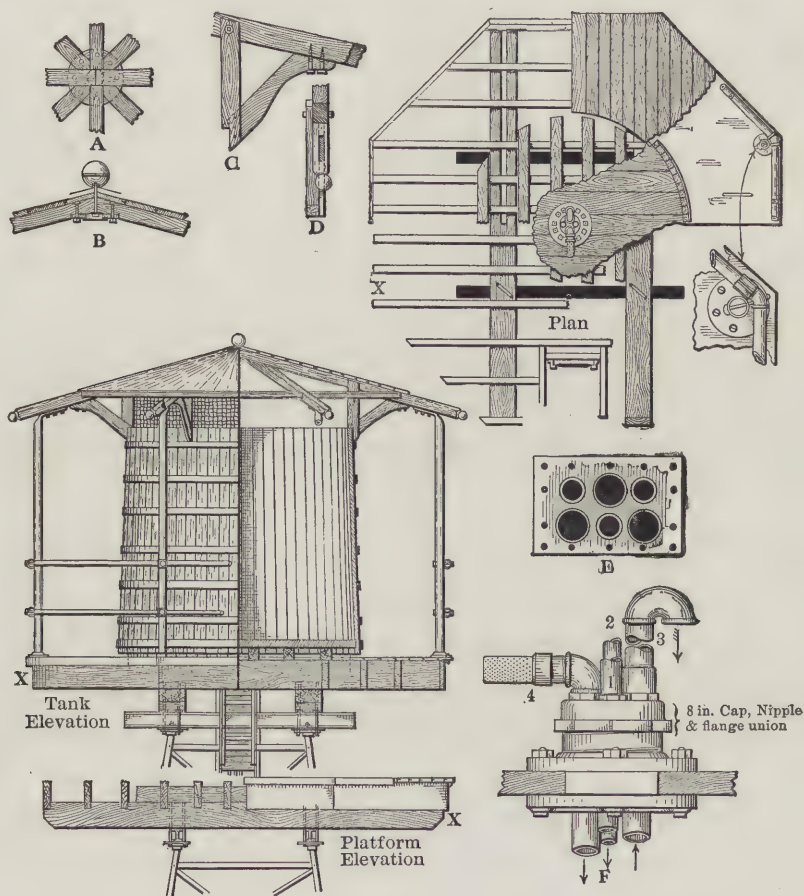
WOOD TANK AND COVER WITH BALCONY RAILING ON STEEL TOWER
